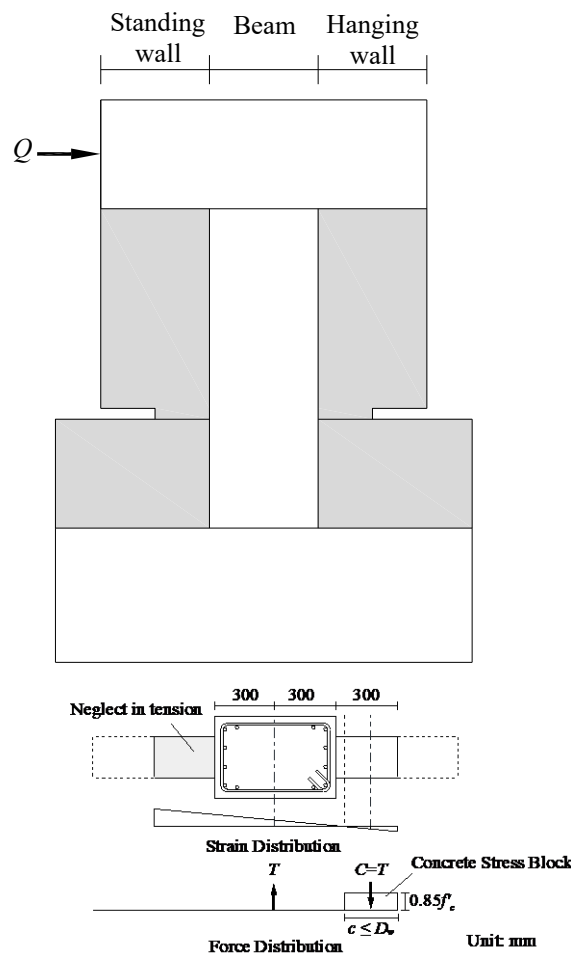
Schematic diagram of the forces on the cross-section
